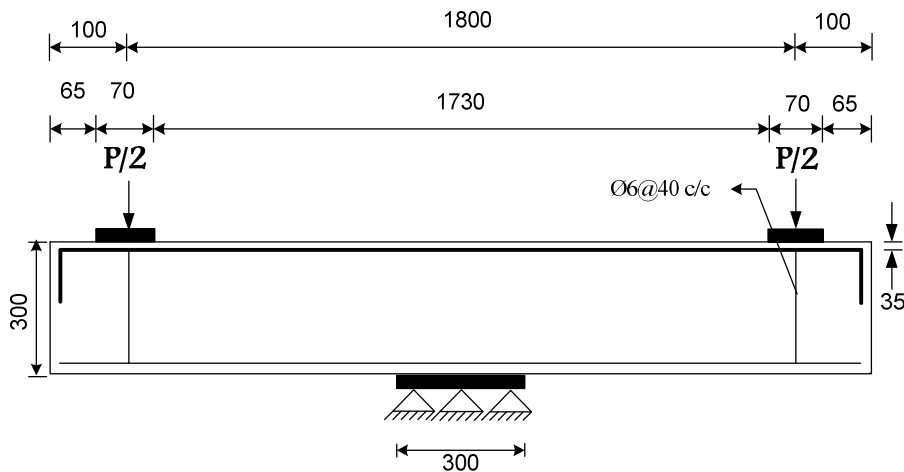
Details of Prismatic Beam (PB-0S-WC)
